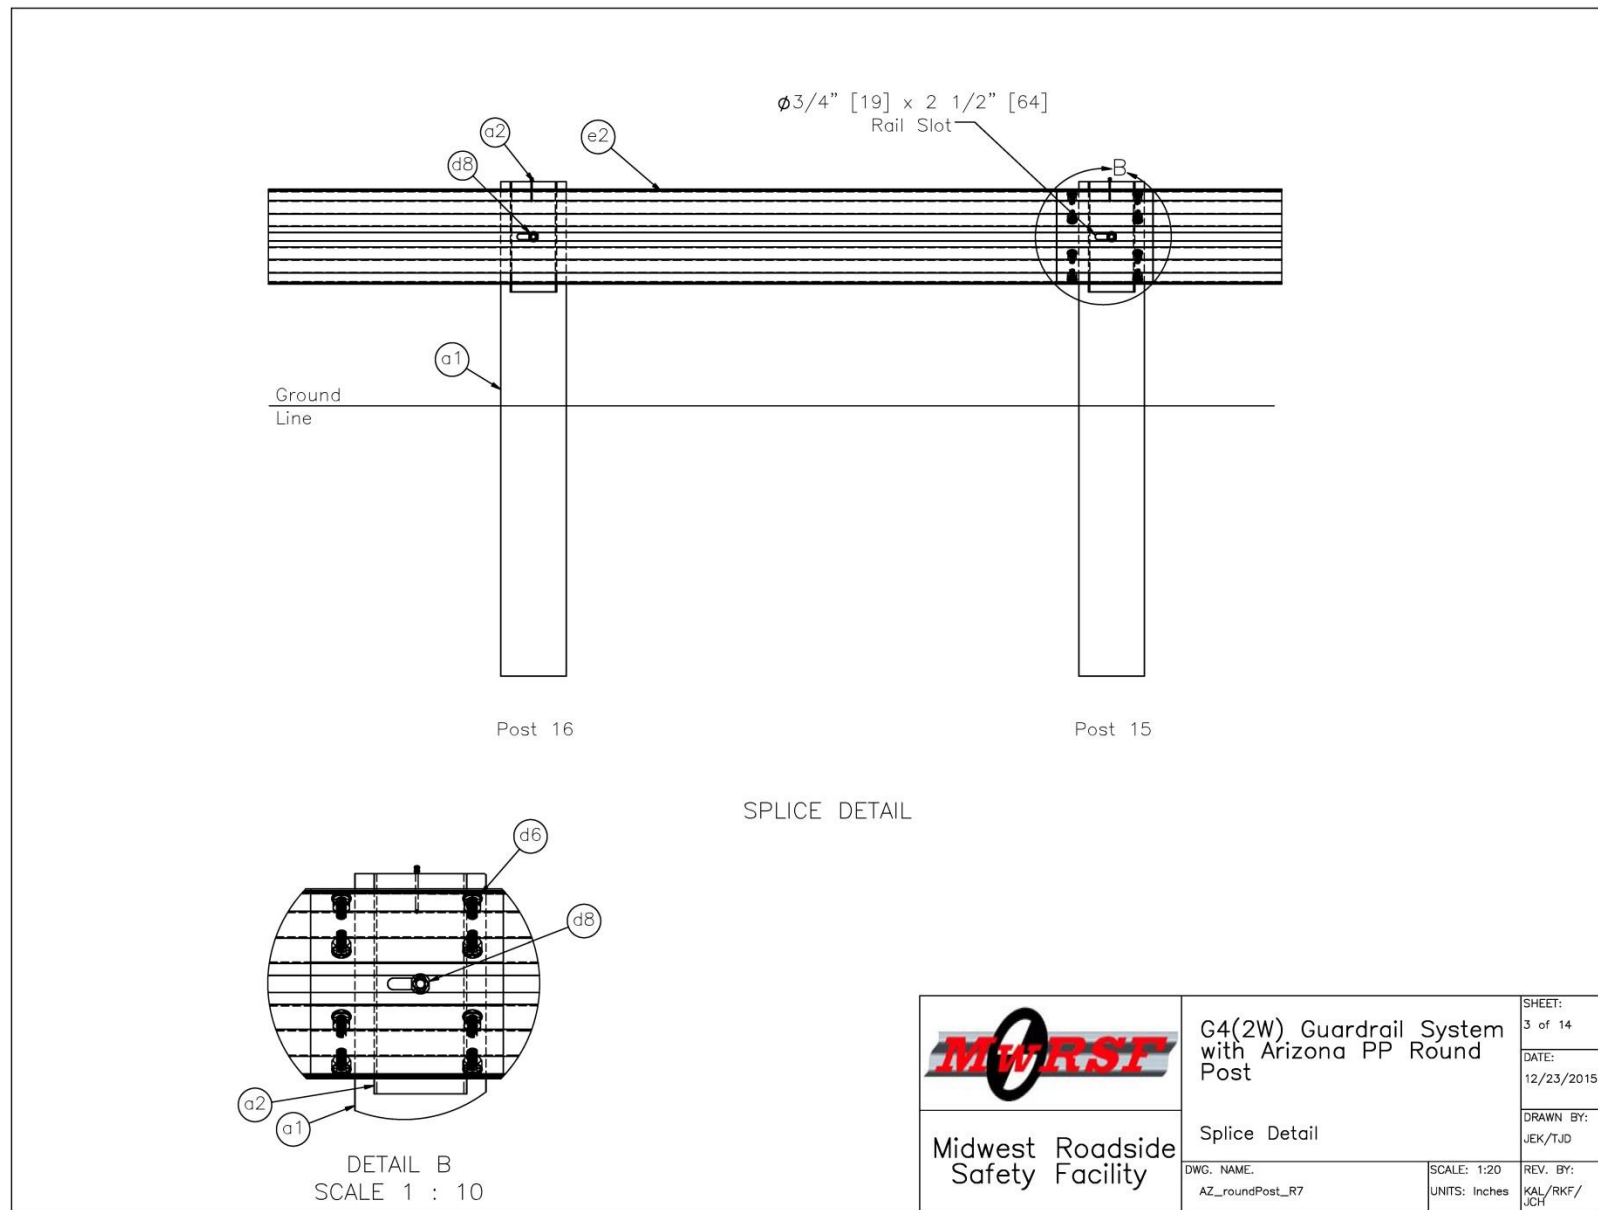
Guardrail Splice Details, Test No. AZRP-1
